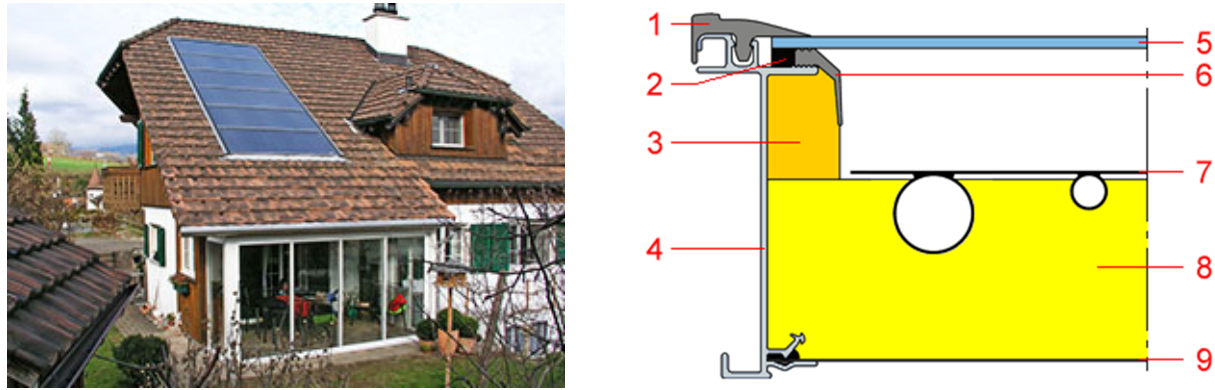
Solar Thermal Collector and Sectional View-Consolar PLANO 27H [13]
